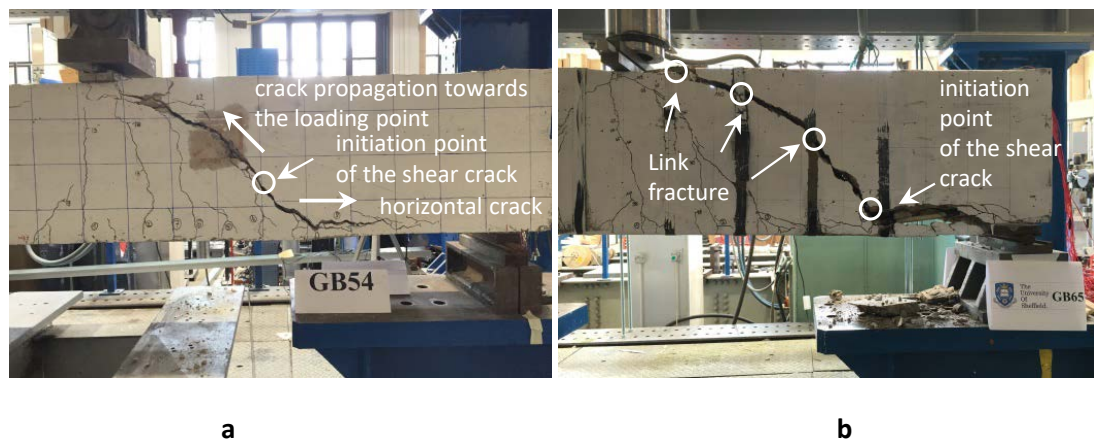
Shear failure mode of the beams; a – test GB54; b – test GB65
